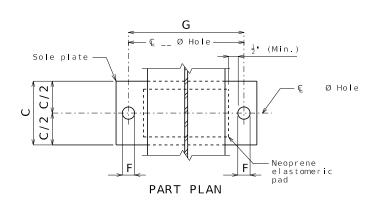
/4"Ø THRU 2 1/2"Ø ANCHOR BOLTS
